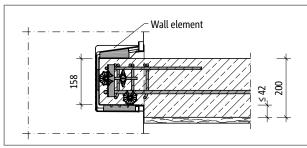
Schöck Tronsole® type Z: Wall element as stay-in-place formwork; underside of the landing lower than the connection frame of the wall element
